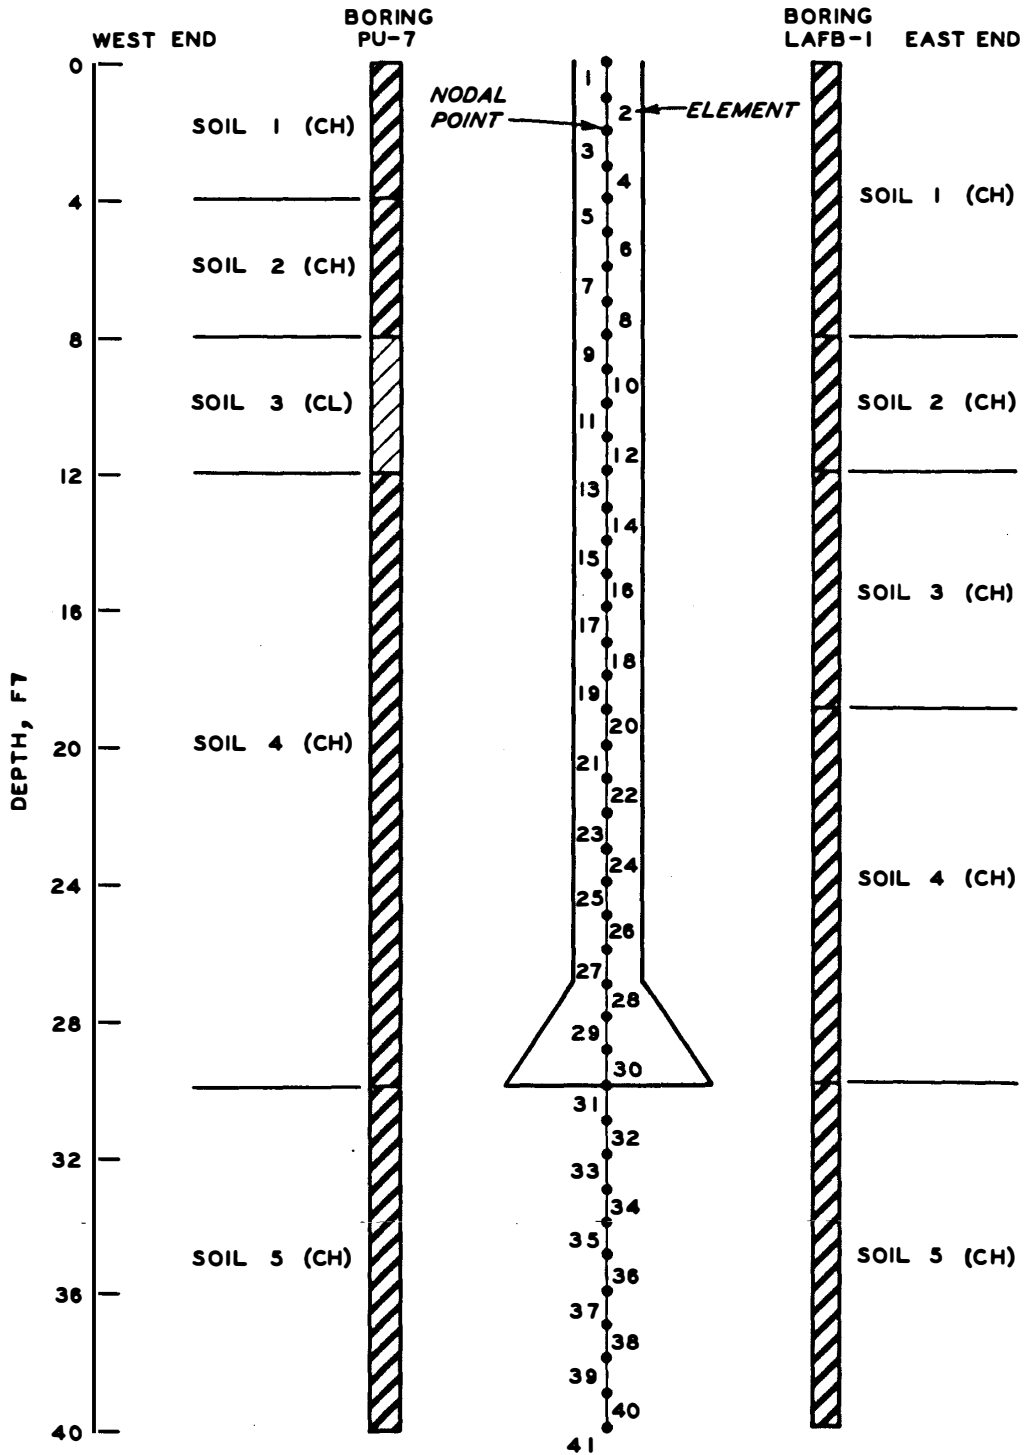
Deep foundation pier 30 ft below ground surface with deep water table
